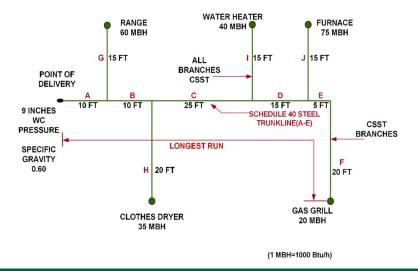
Branch Piping System with Schedule 40 Steel Pipe Trunkline & CSST
